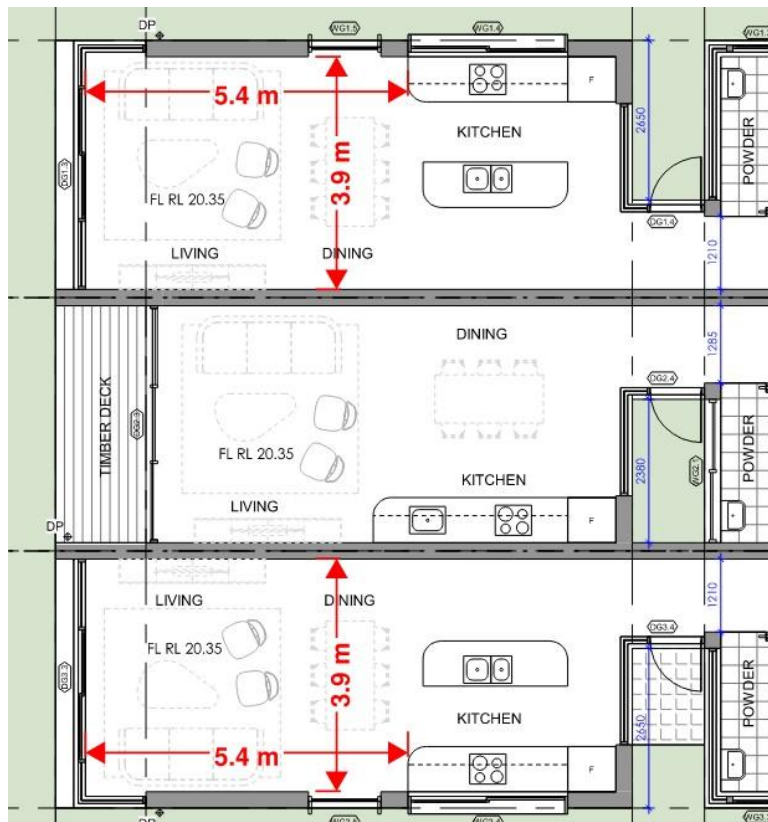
Proposed ground floor plan (Source: Bryan Long Group)
